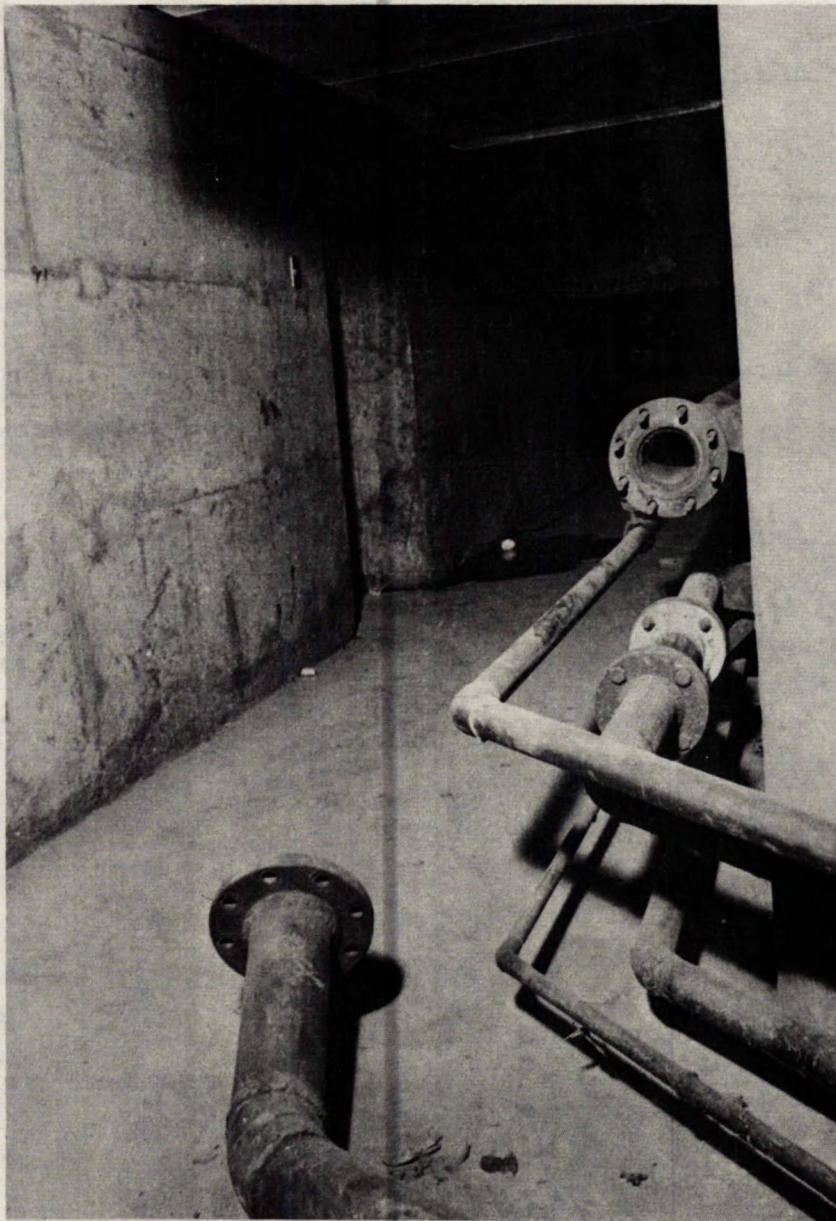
Joint No. 1 showing one arm held to the wall with a pipe bracket just behind the joint, the other arm being blown outward and away from the joint. (See Figure 13).
